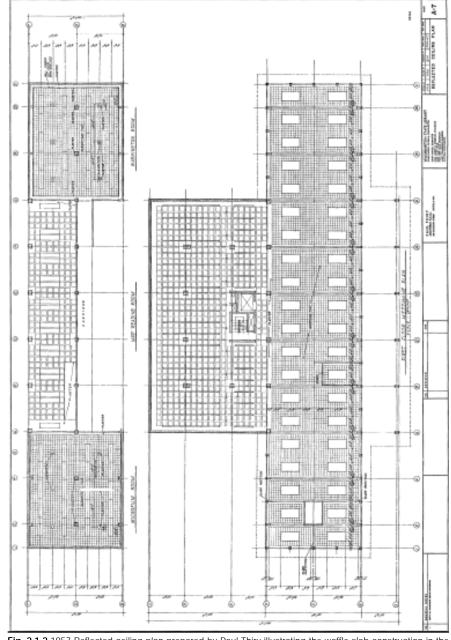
1957 Reflected ceiling plan prepared by Paul Thiry illustrating the waffle slab construction in the Washington State Library. Drawing courtesy of the Washington State Department of General Administration Archives.
